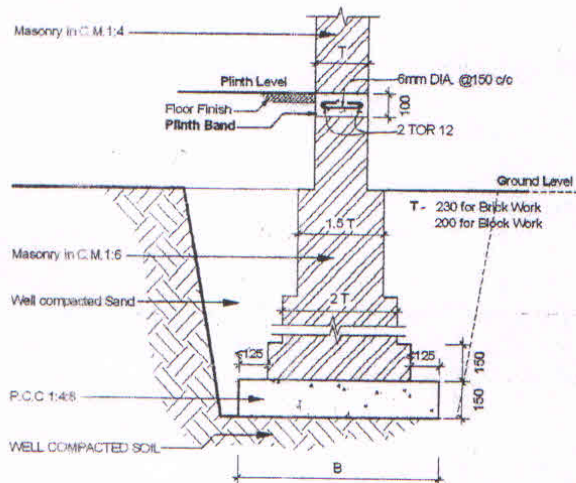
Foundation Detail with Plinth Band in Brick or, Concrete Block Masonry
